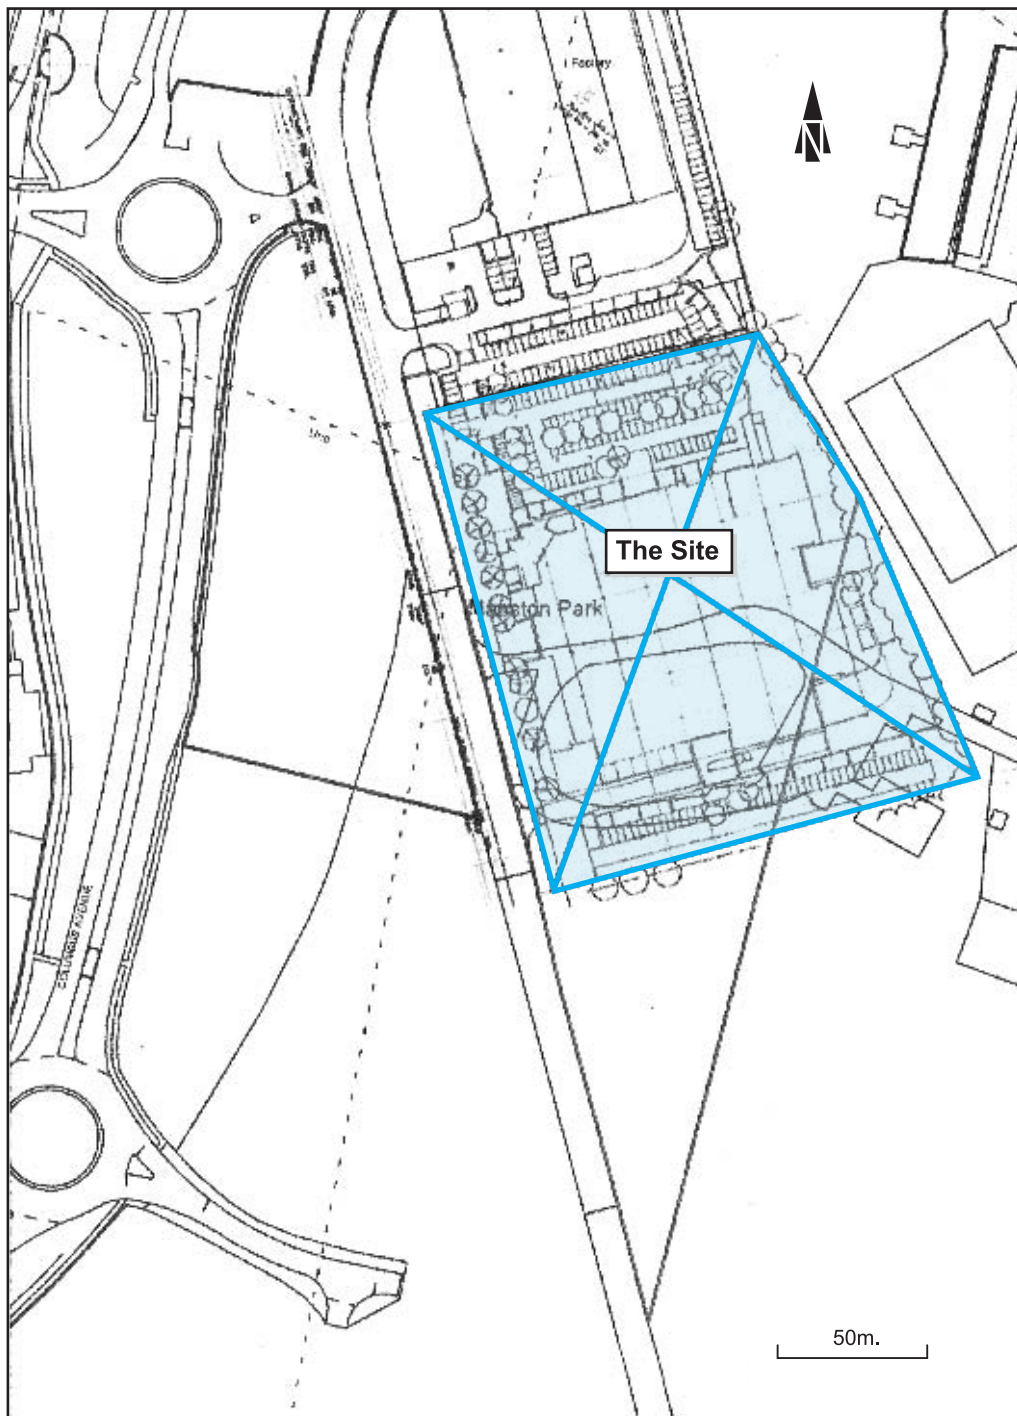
Proposed development site boundaries (after a plan supplied by Clague LLP).
